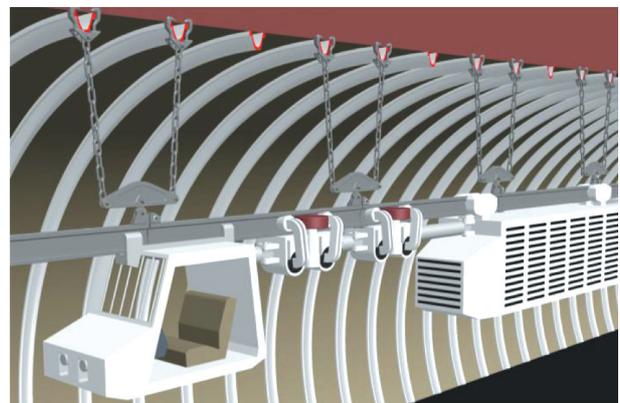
Suspending transportation route on the support's arches with use spreader beam balancing load to suspensions (maximum load to rail connector towards suspension direction 80 kN) [11]
